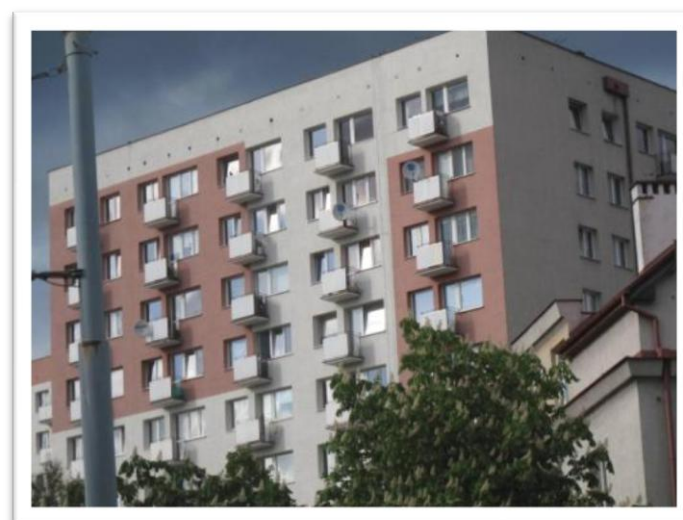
Example of a building constructed in prefabricated panel technology after retrofitting with expanded polystyrene foam and plaster in Poland
